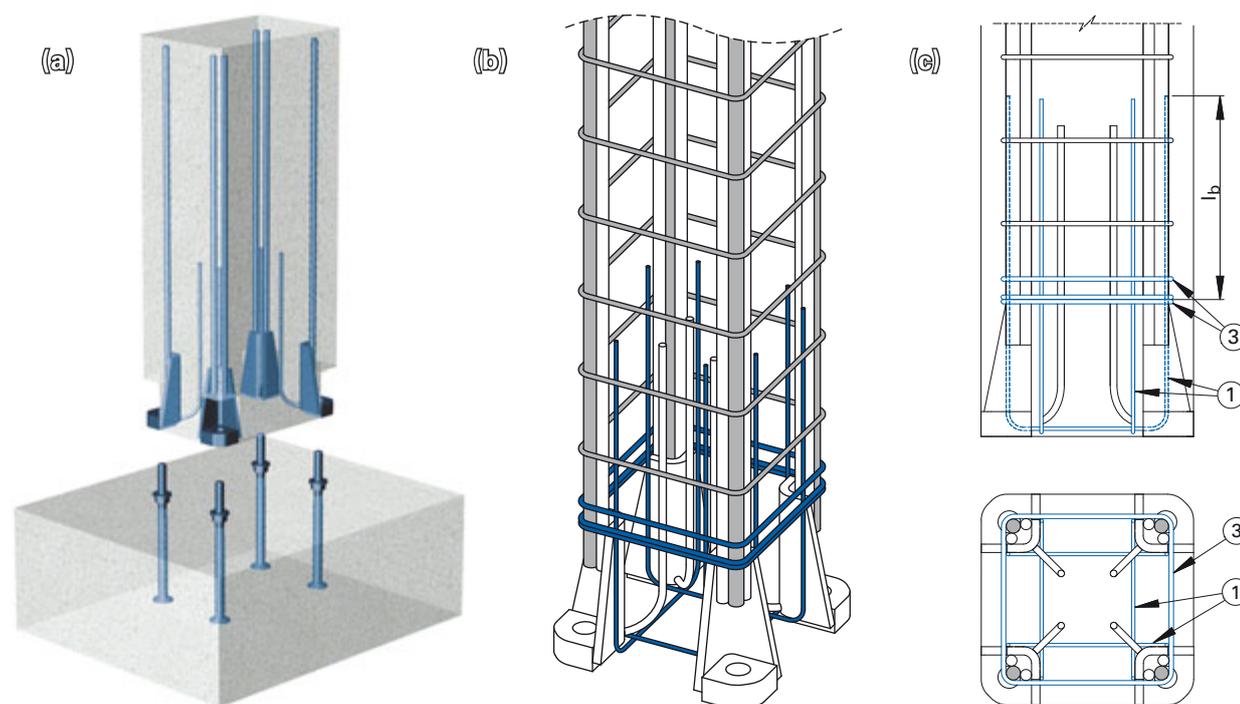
Representation of the studied column to foundation system: a) connection between the shoes and the anchor bolts; b) detail of the welded bars and of the lap splice along the height of the column; c) details of the additional reinforcement
